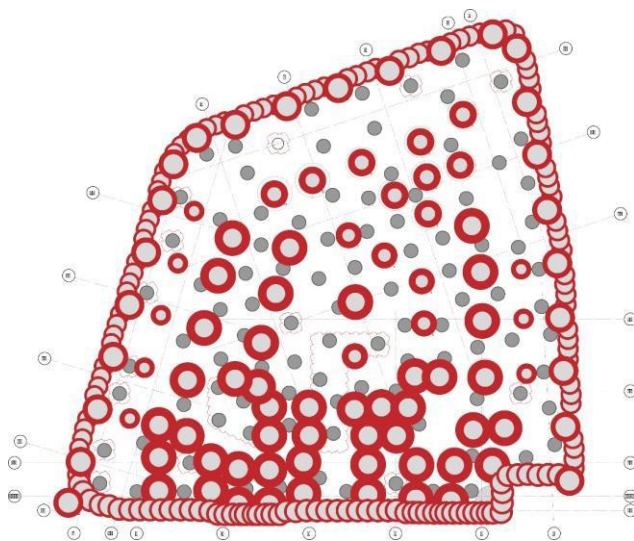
Illustration of the exclusion envelopes (in red-gray) applied to each existing pile and contiguous wall. Piles in gray denote proposed new foundation.
